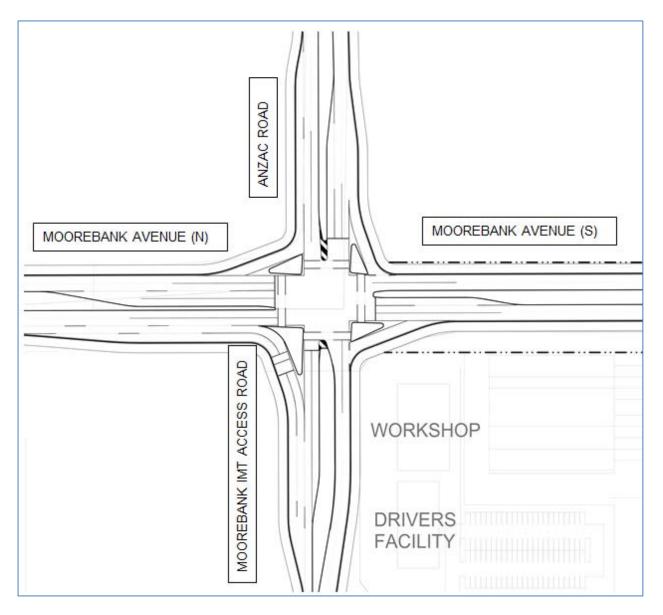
Proposed Moorebank Avenue, Anzac Road and Moorebank IMT Access intersection
